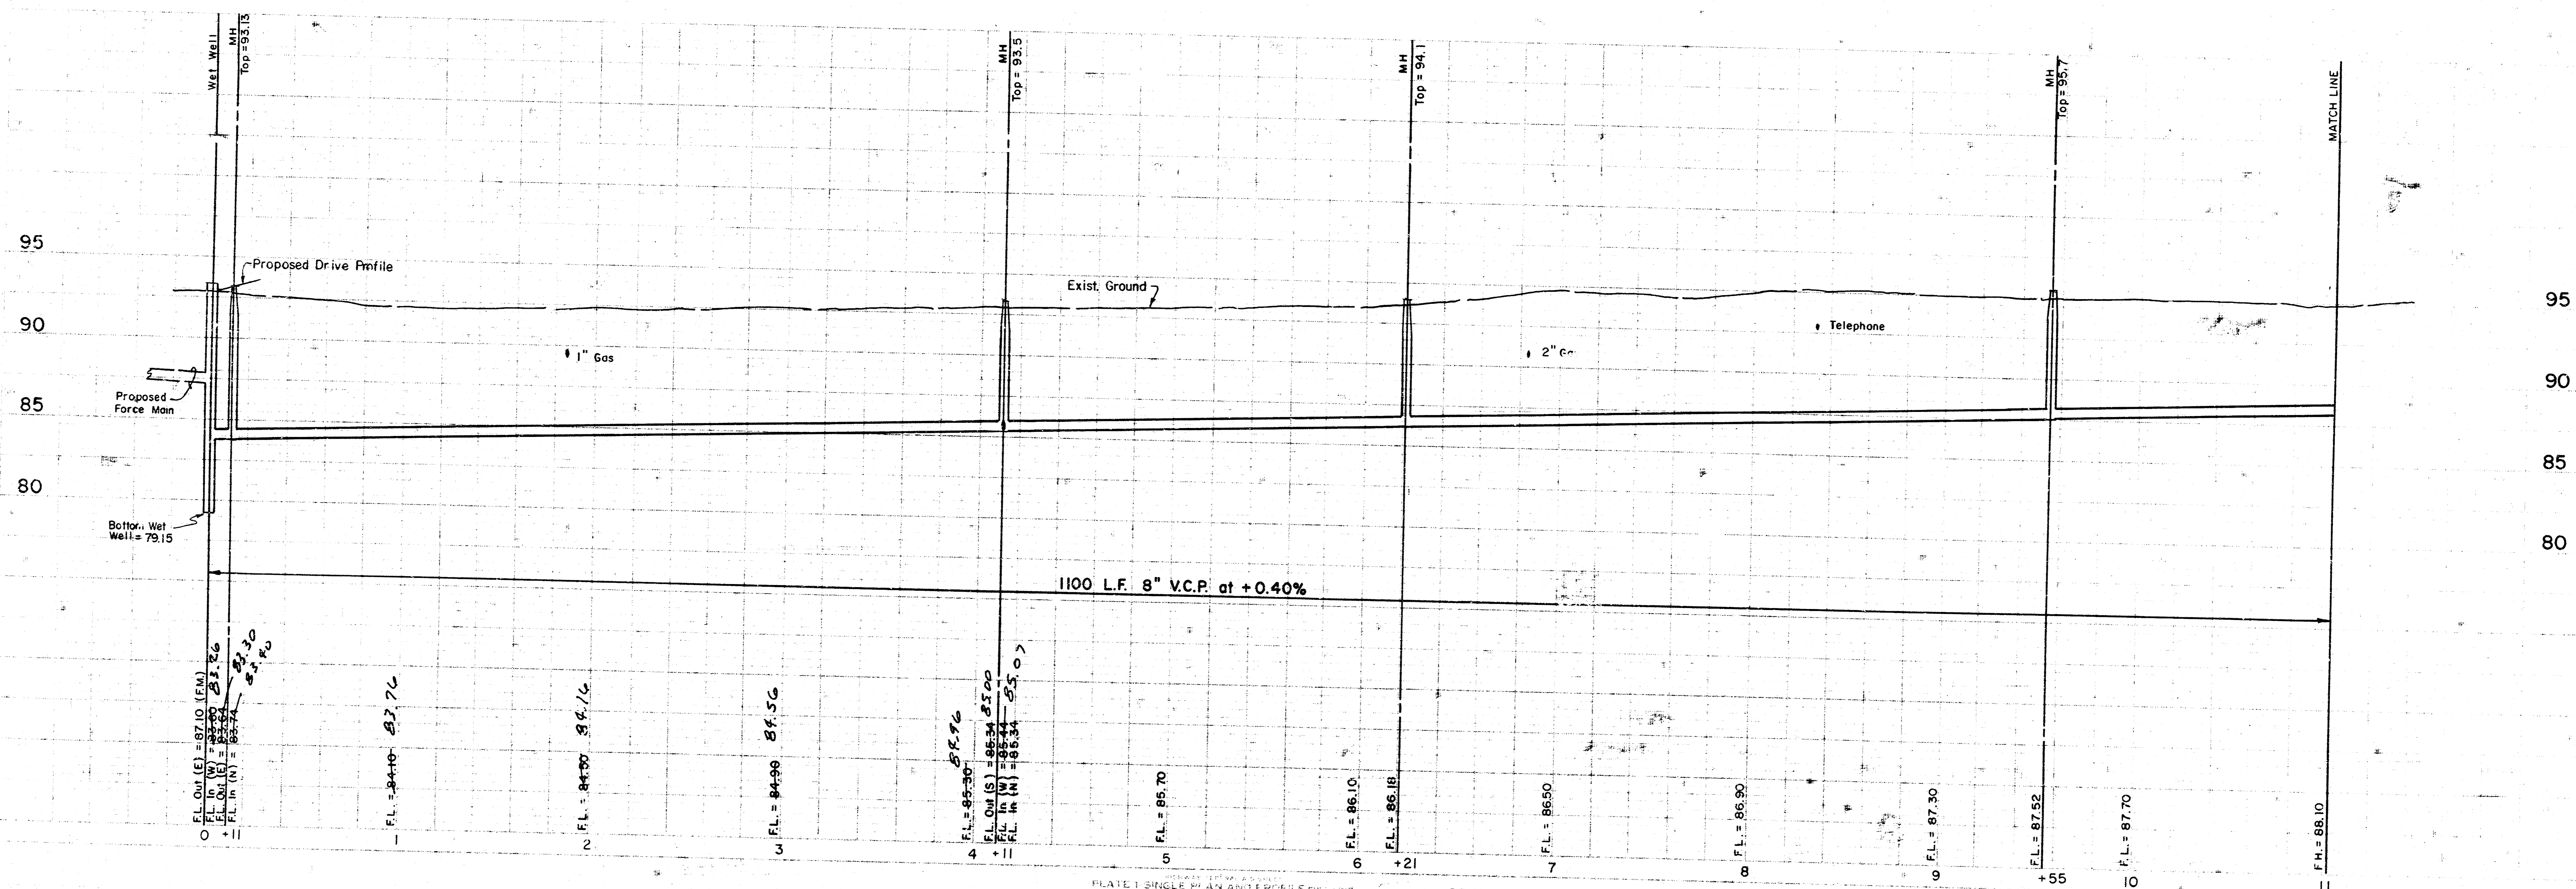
SINGLE PLAN AND PROFILE FULL LINE
